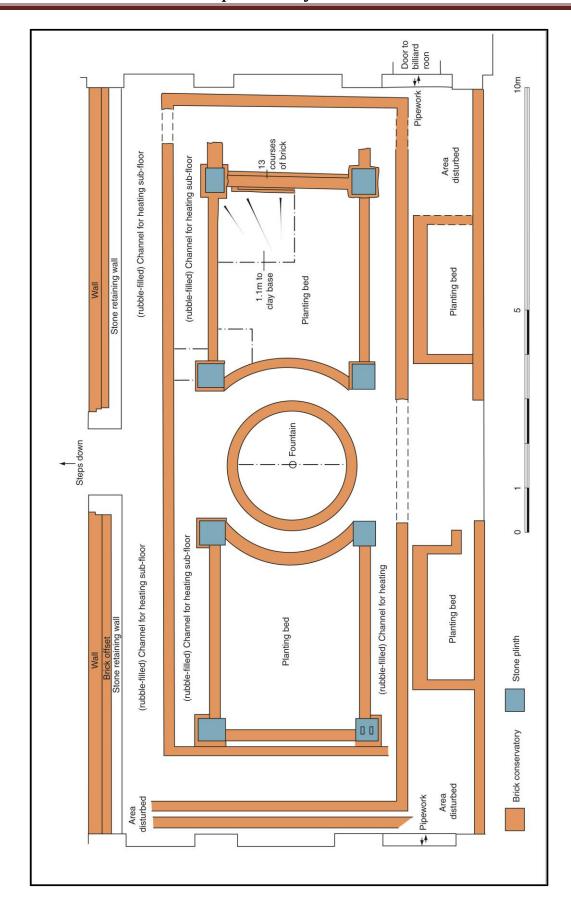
Plan of the Conservatory as excavated (Andy Isham); North is to the left, Billiards Room to the top, Dining Room to the bottom. The pond and planting beds are now picked out in the floor of the Delapré Abbey café which occupies the site.
